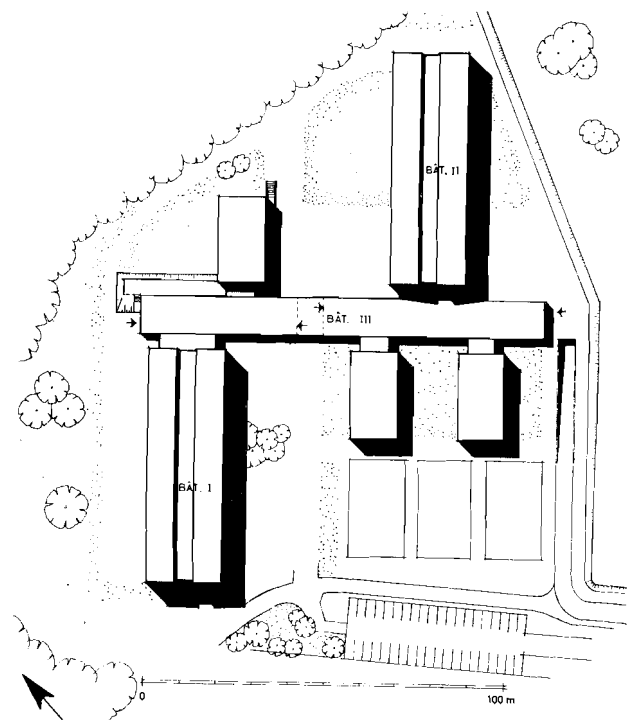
General lay-out of Collège de Pinchat, in the course of building. Buildings I and II are the class-room buildings; building III is the link building. The 3 small buildings, like buds, are the gymnasiums.
